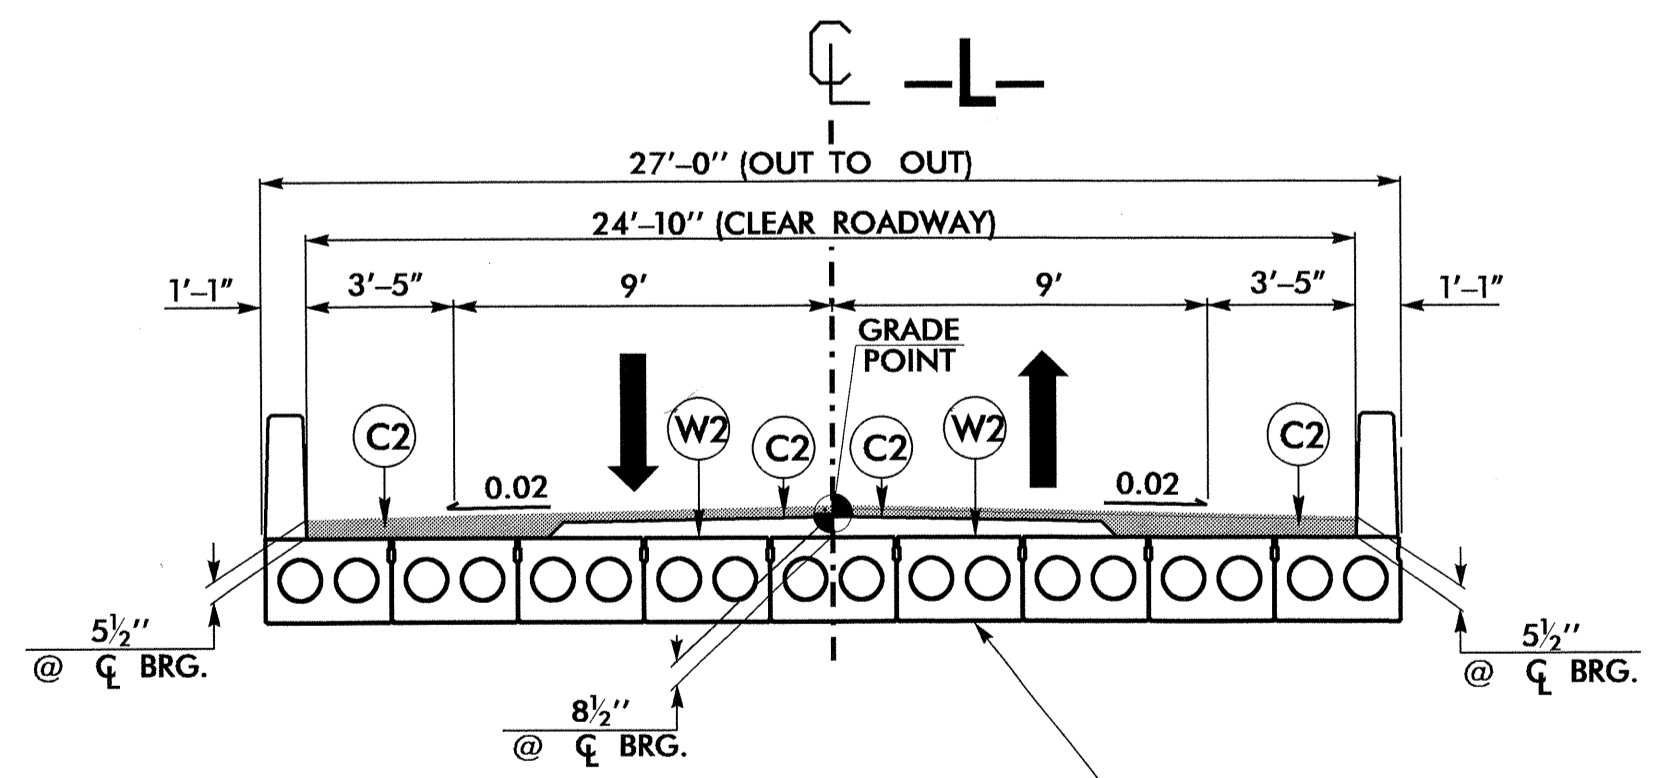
DETAIL SHOWING METHOD OF WEDGING ON BRIDGE
